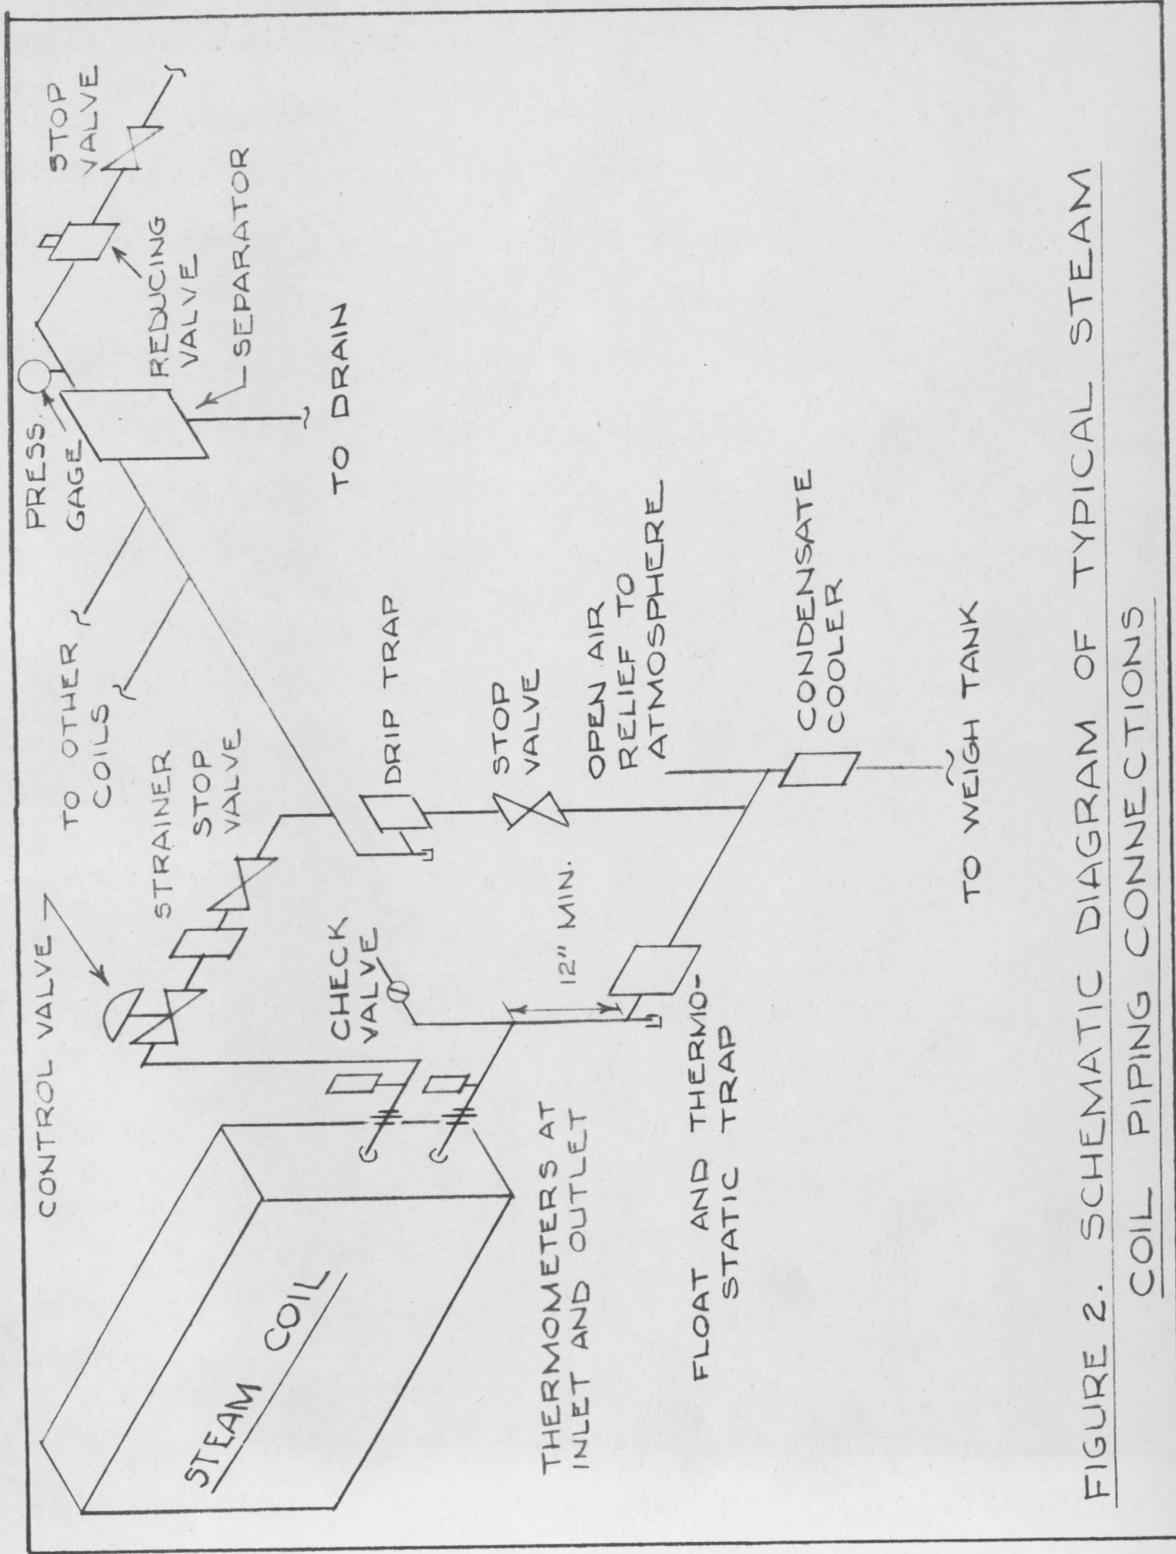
SCHEMATIC DIAGRAM OF TYPICAL STEAM COIL PIPING CONNECTIONS
